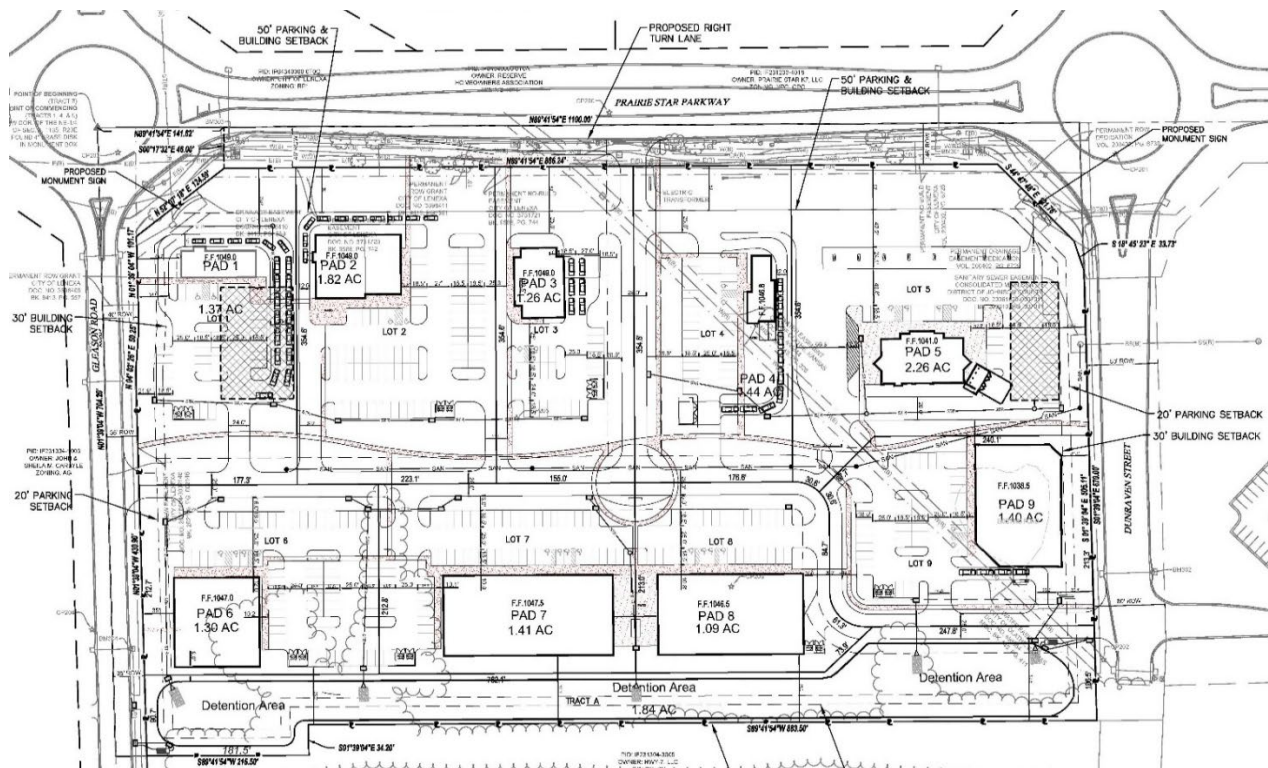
Preliminary Plan for Prairie Star Parkway Center
